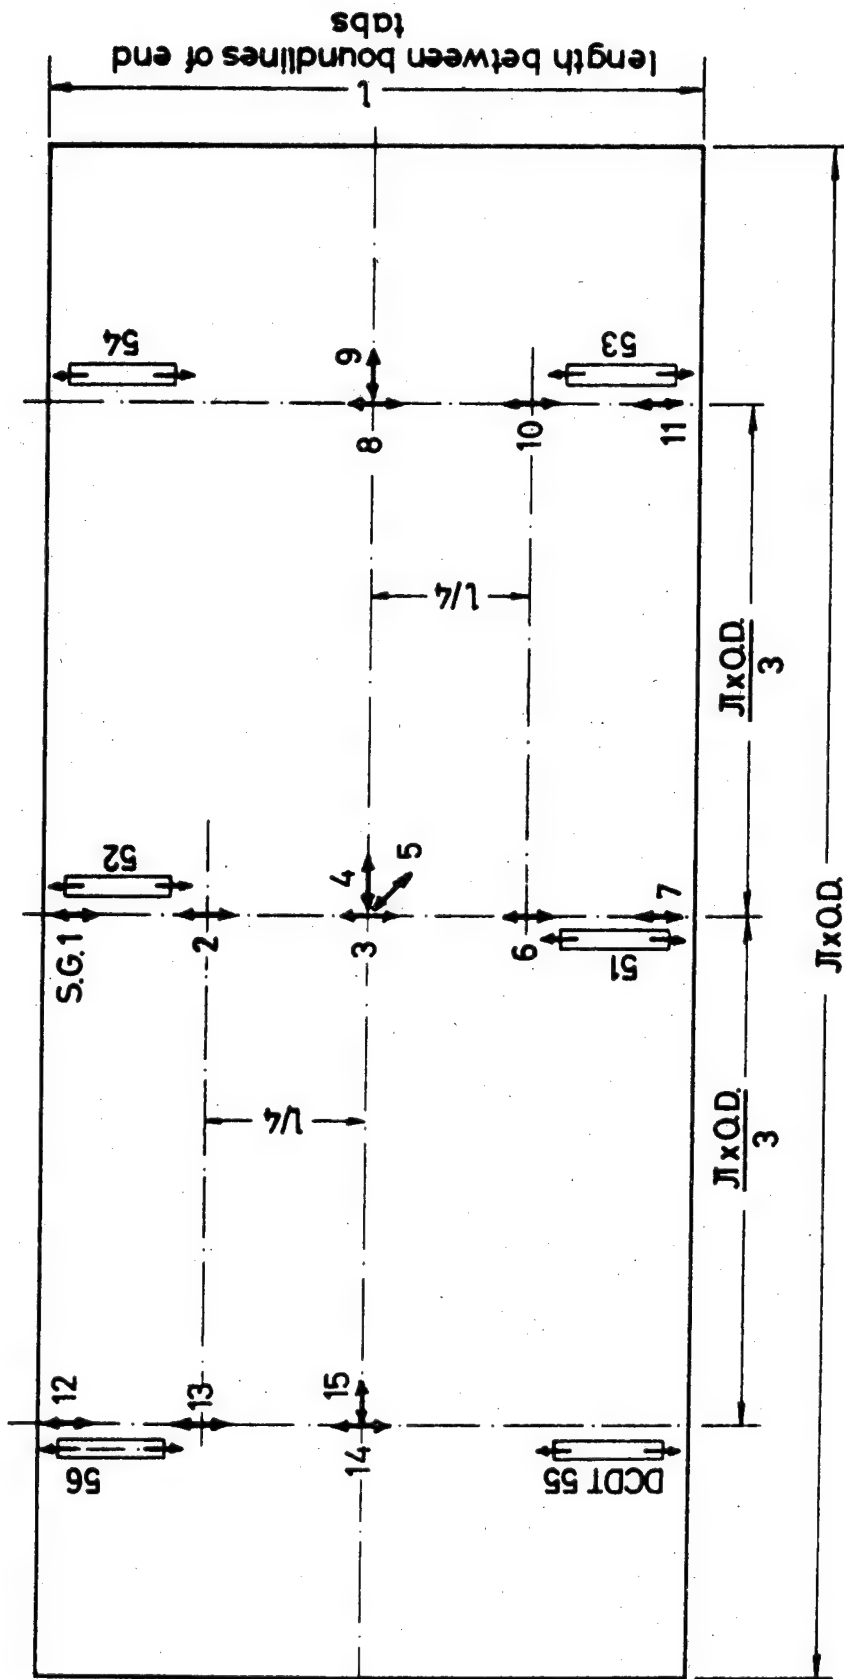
DEVELOPED SURFACE OF TUBULAR SPECIMEN-STRAIN GAGE AND DCDT LOCATION
